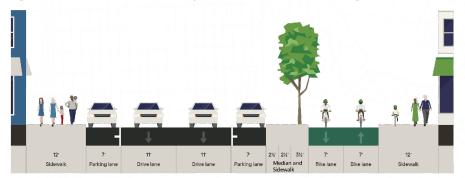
Howard Streetscape Typical Cross Section (looking east)
